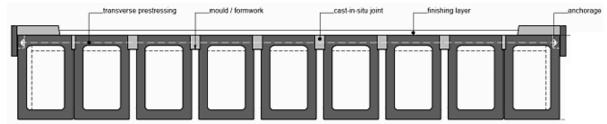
Cross-section of box beam girder bridge [42], adapted.
